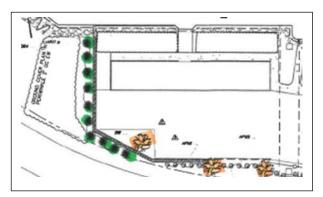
Proposed Northern Parking Planting at the Community Bldg.
